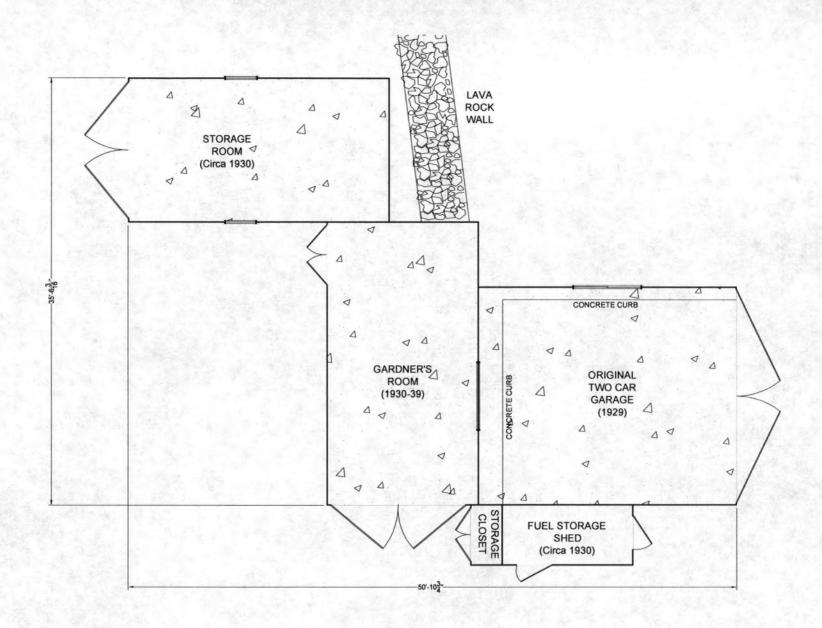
FIGURE G - BUILDING 3, BARN FLOOR PLAN
